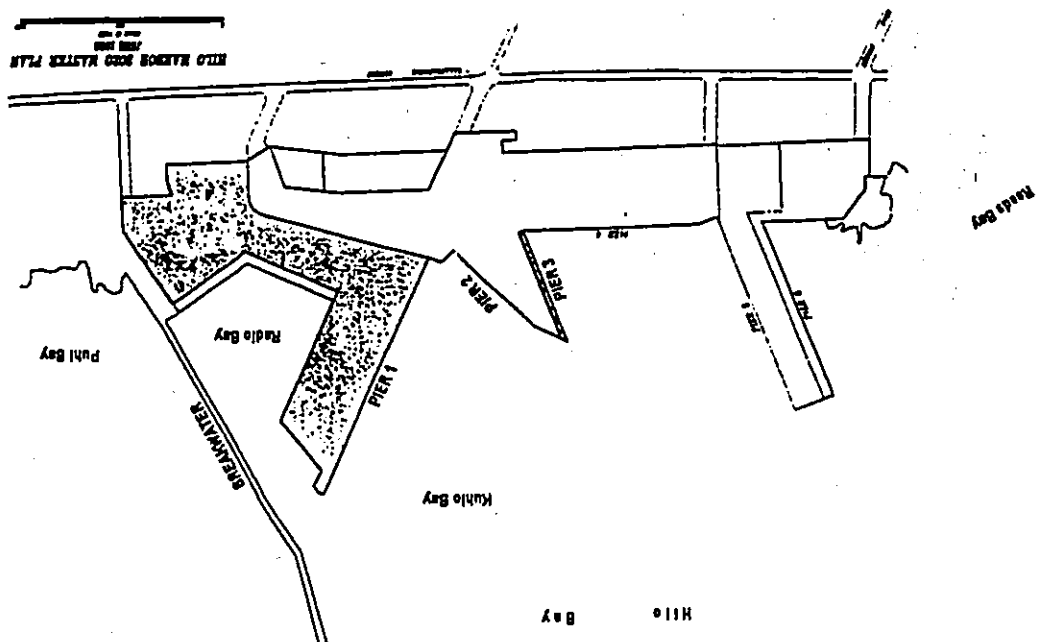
Hilo Harbor showing existing Piers 1 - 3 and proposed Piers 4 - 6.
